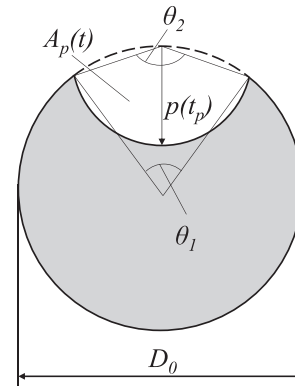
Hemispherical geometry of pitting in a corroded reinforcing bar.⁶²
